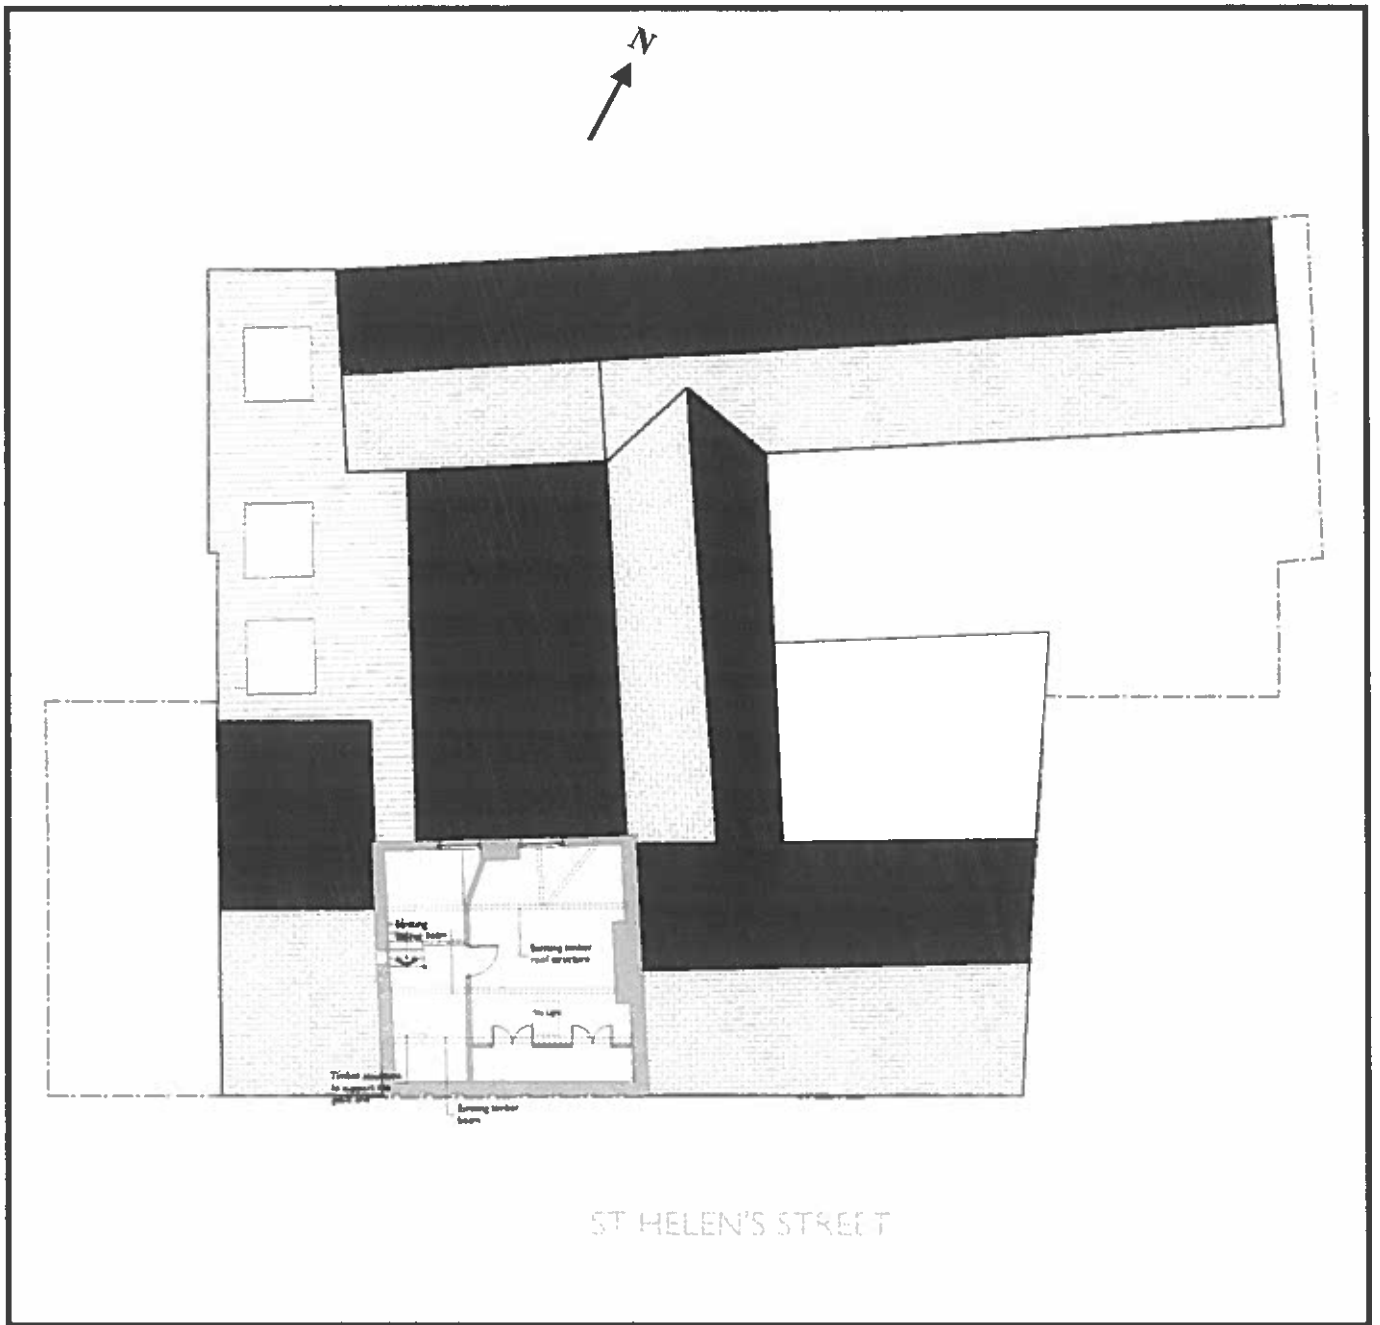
Present third floor plan of 10-14 St Helen's Street, Derby. Scale 1:200.
